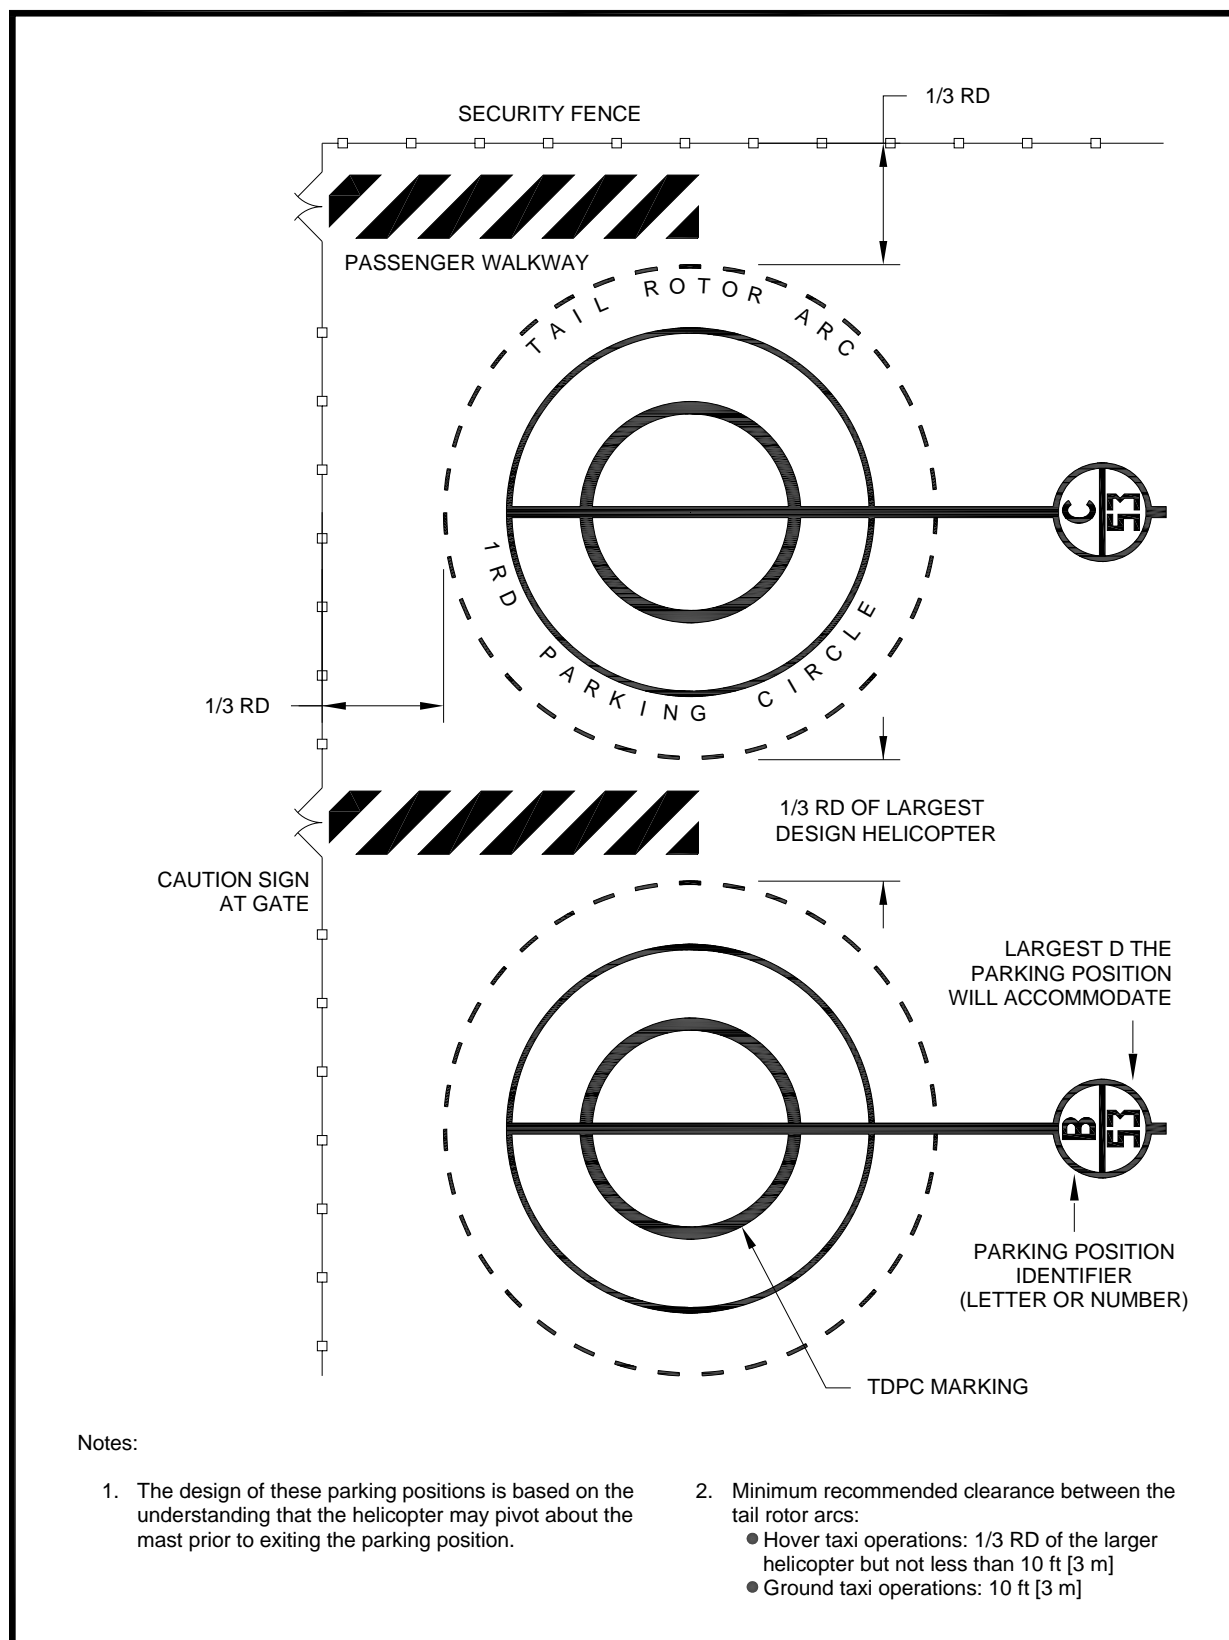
Parking Area Design – “Turn-around” Parking Positions: Hospital
